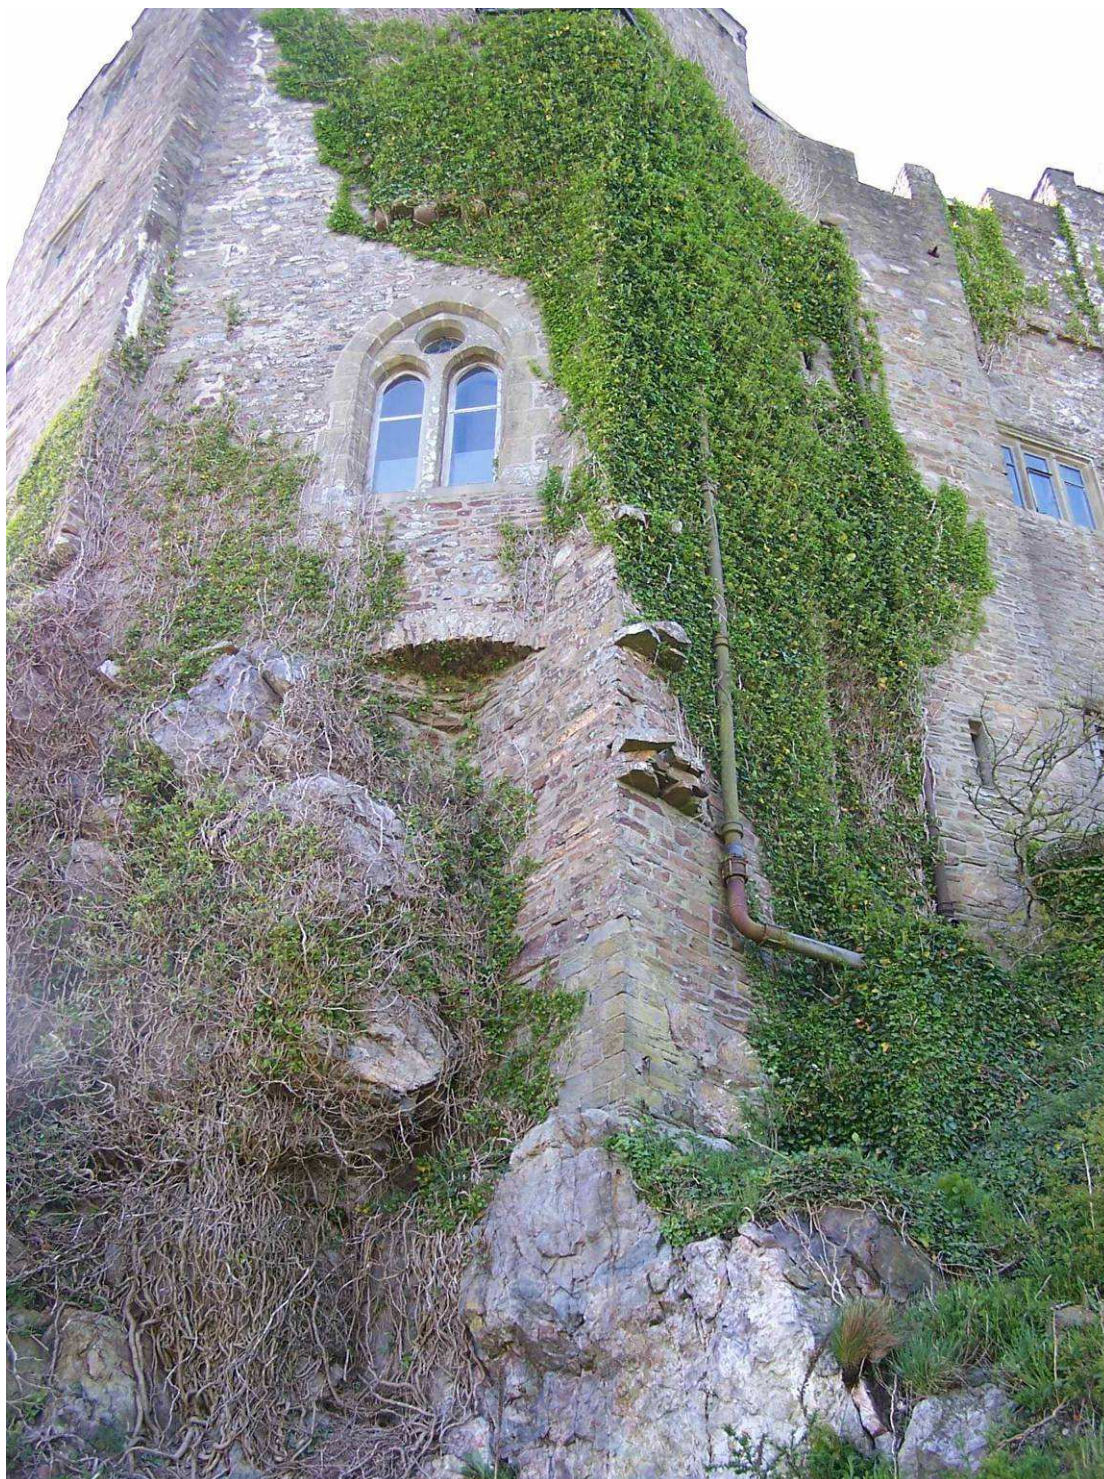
Southeastern elevation showing Gothic window inserted in 1900s, relieving arch beneath and three sets of projecting stones to the right.
